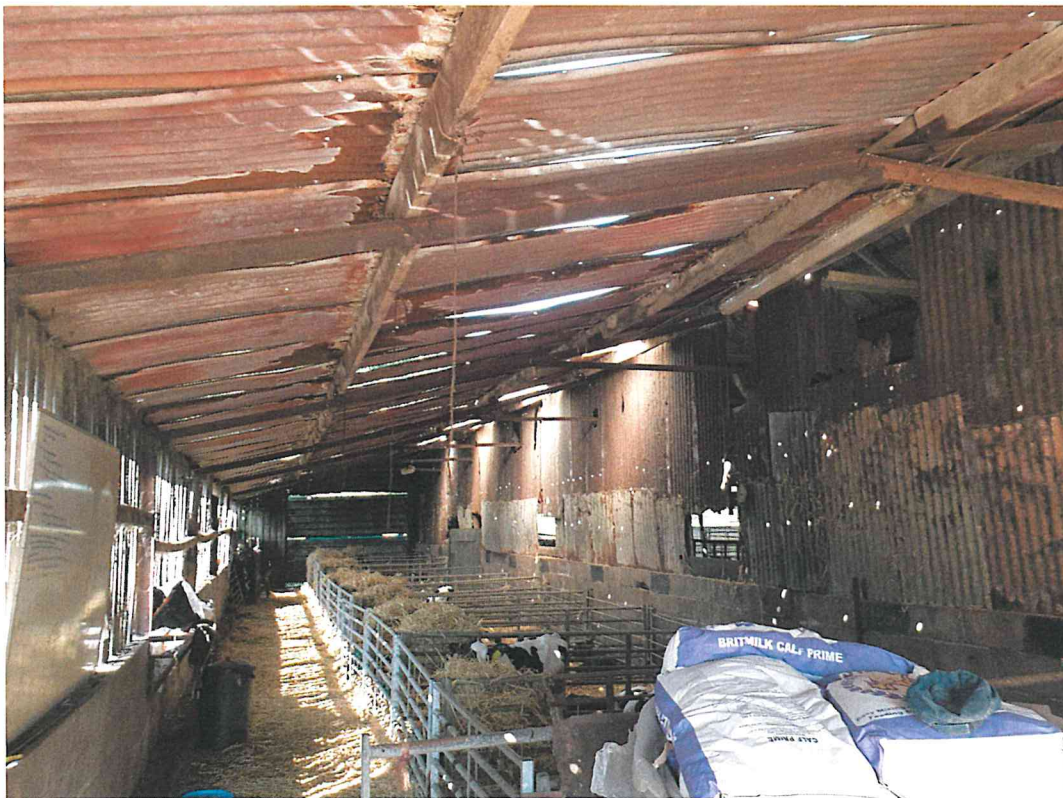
VIEW ON THE LEAN-TO STRUCTURE GENERALLY
